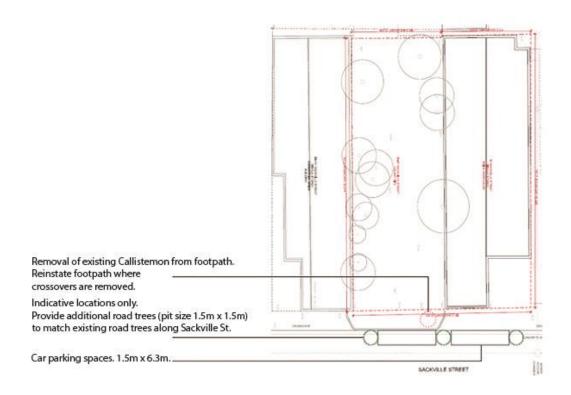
Additional Street Tree and car parking proposal (indicative). Not to scale
